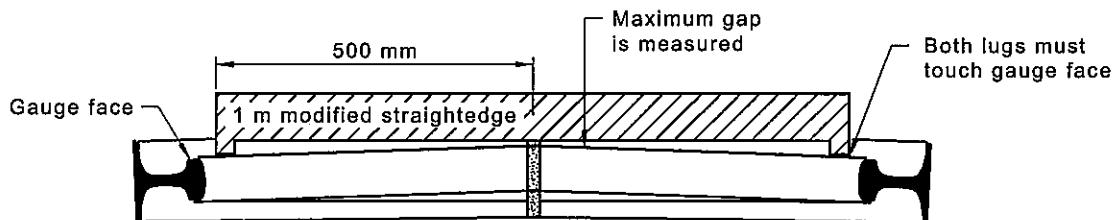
JOINT GEOMETRY—SURFACE ALIGNMENT METHOD—
